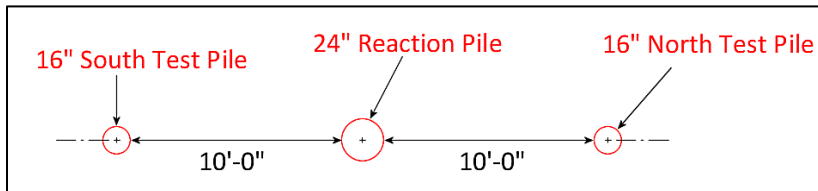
Test pile location and layout plan view (Google n.d.).
